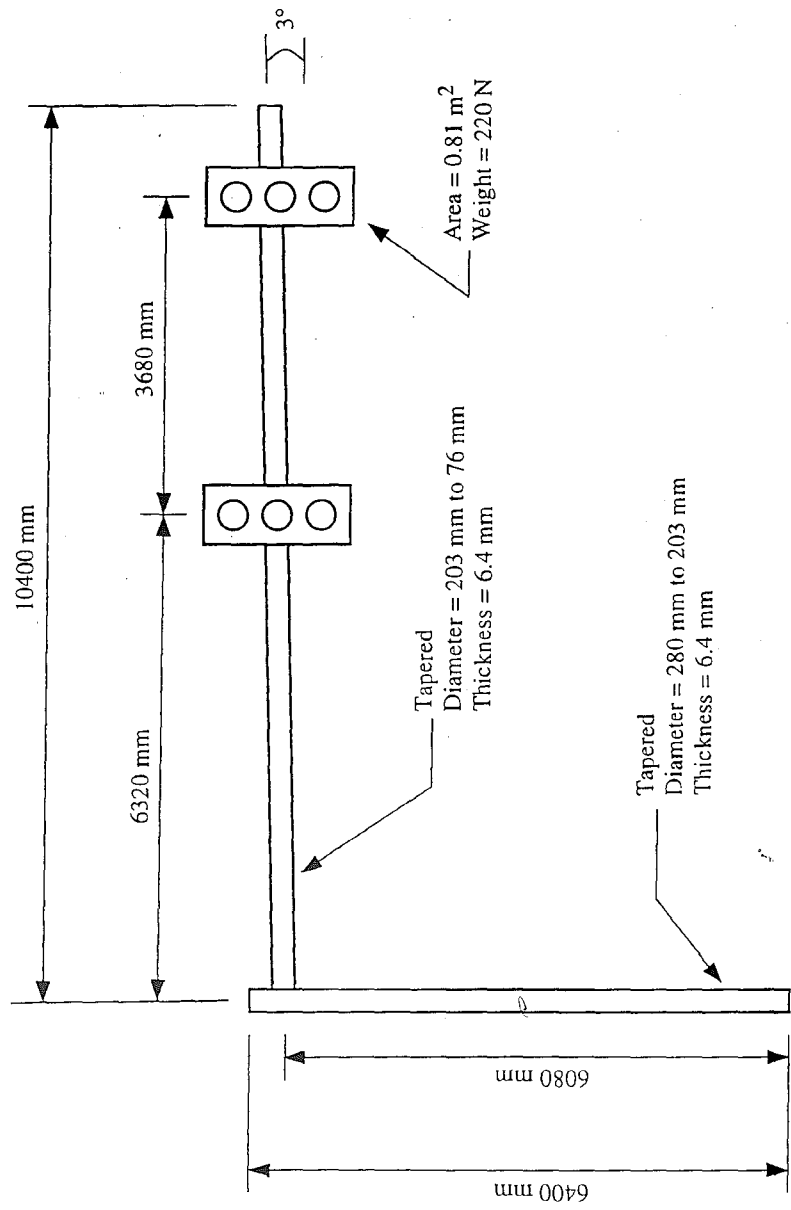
Details of Full-Scale Cantilevered Signal Support Structure (Signal Support #1).
